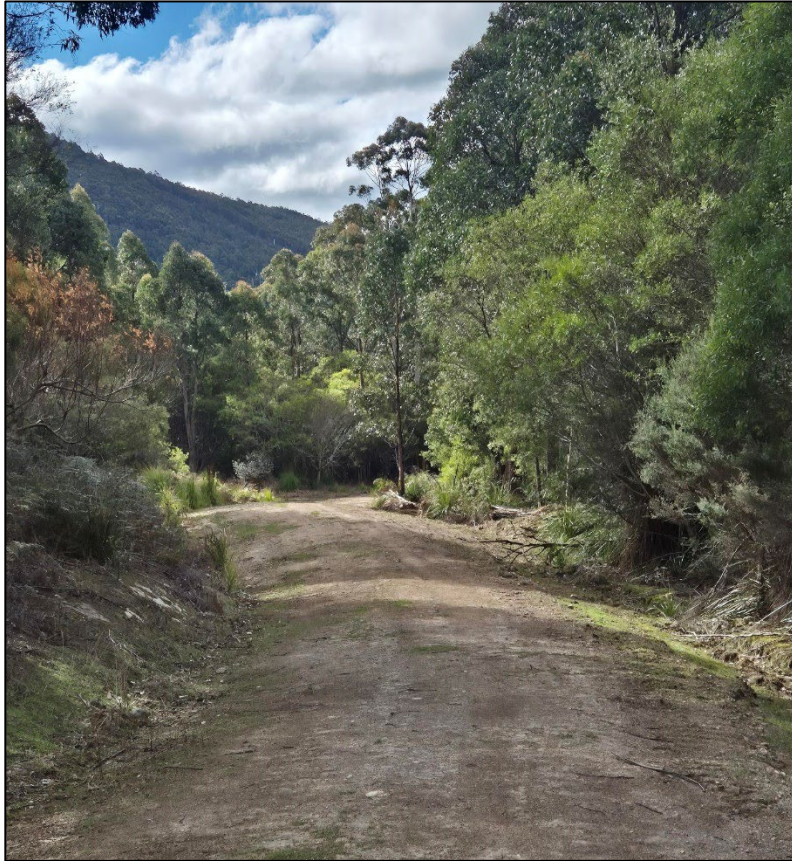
Existing formed access road to new building area (formed by TFS as a fire break).
